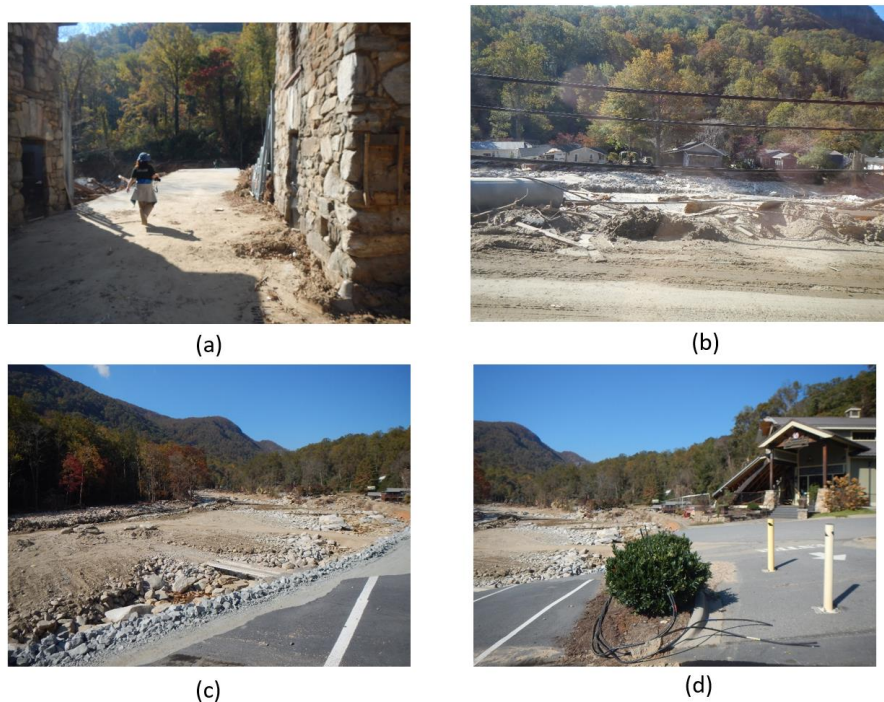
Hurricane Helene flood-battered region in Chimney Rock Village, NC: a) Washed away bridge on the Chimney Rock Scenic Road over the Broad River, Chimney Rock, Village, NC; b) from Main Street looking over Broad River; c) scoured Broad River basin in front of Burnshirt Vineyards Bistro on Main Street, Chimney Rock, NC; d) parking lot in front of Burnshirt Vineyards Bistro on Main Street, Chimey Rock, NC. (Photo credit: Shen-En Chen, Sophia Lin, and Qifan Zhao)
